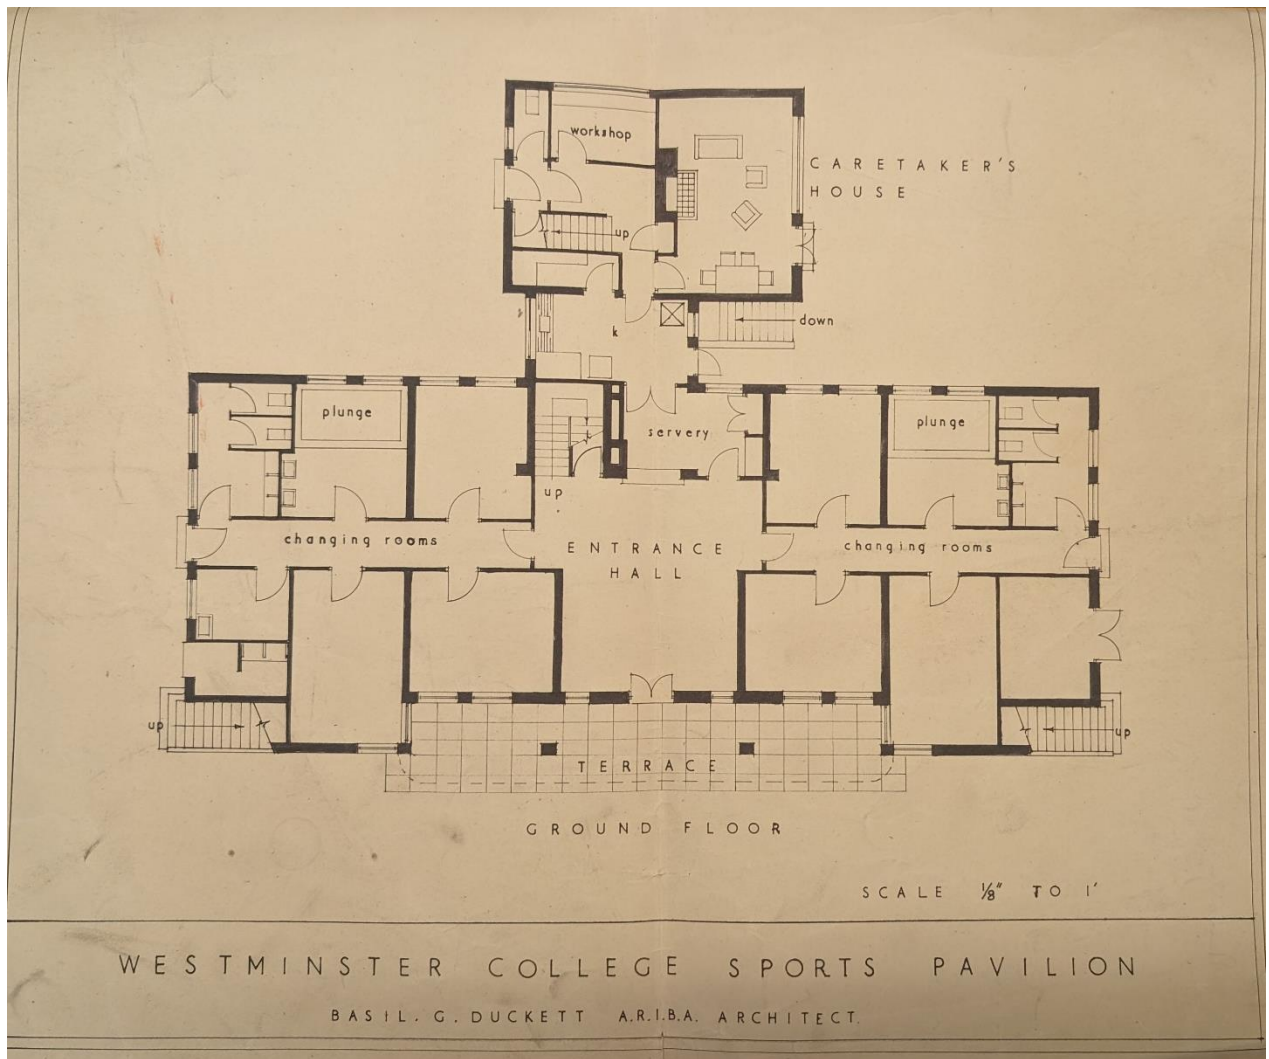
Floor Plan for the College Pavilion at Elmstead Wood
